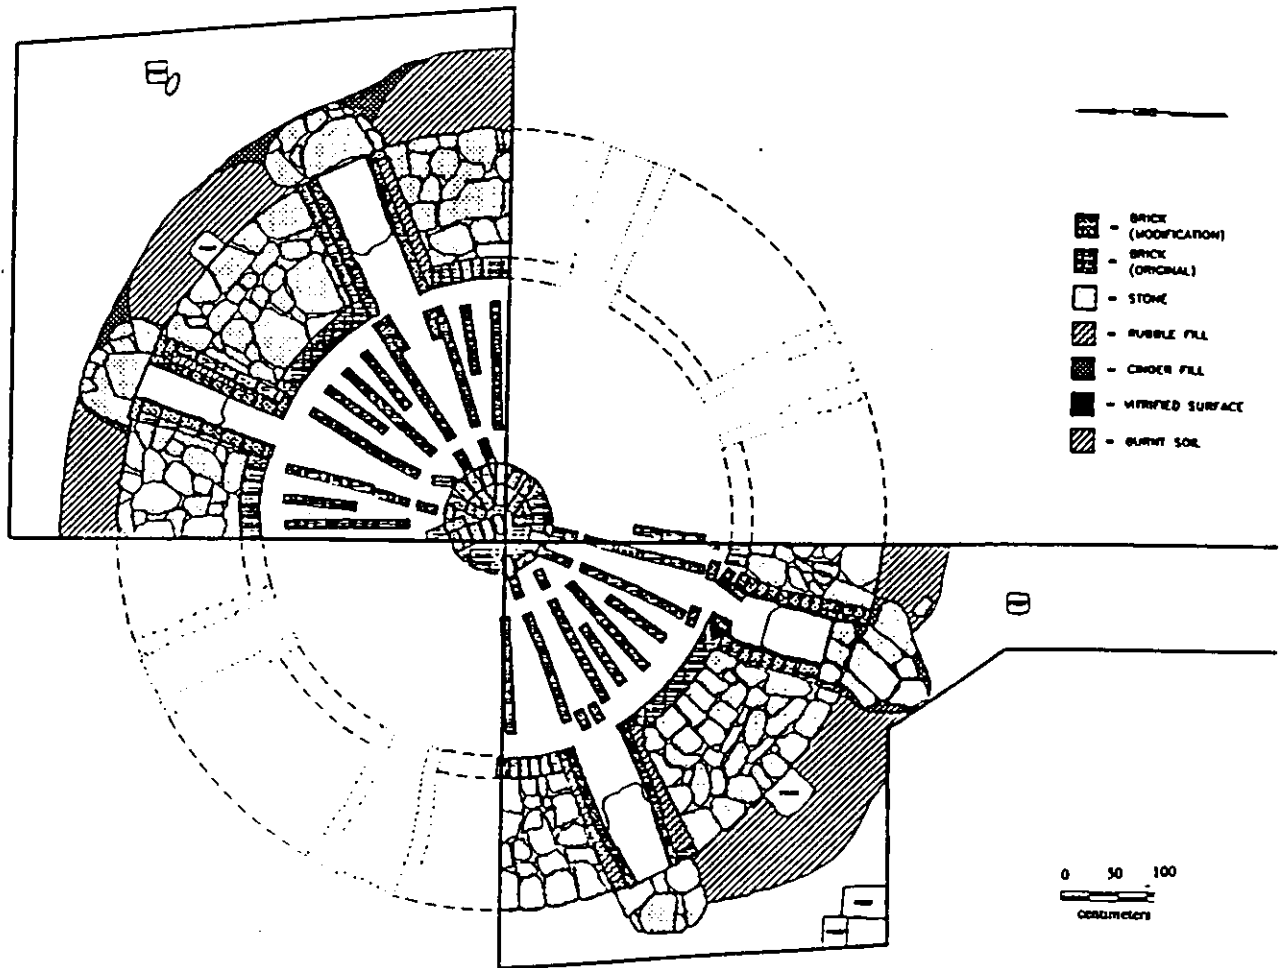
Plan view of Kiln 1. Tile Works Site (11-Gr-70).
